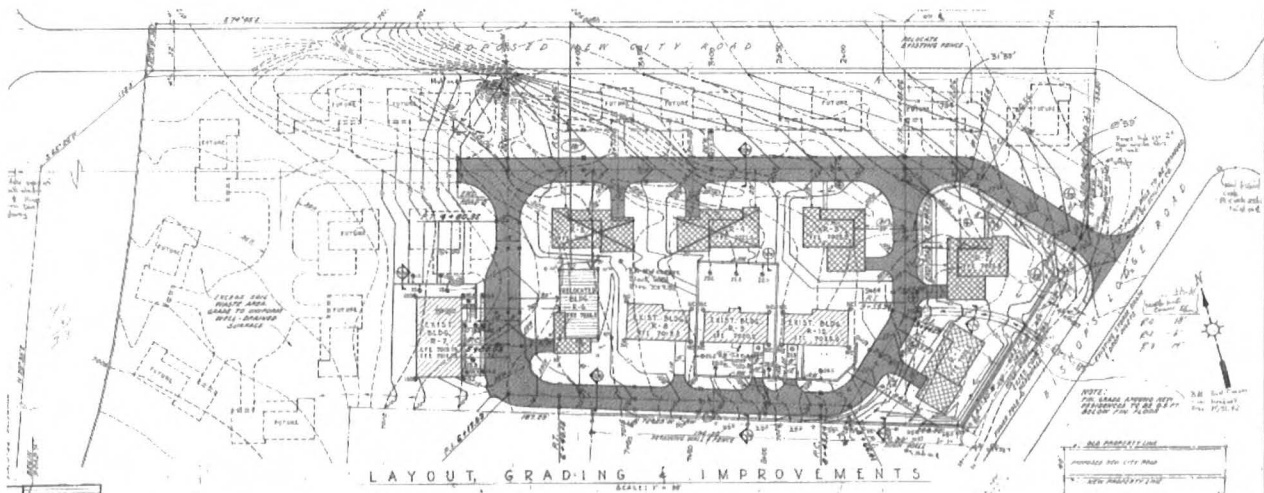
Portion of layout and grading plan showing cottages to be constructed, June 1960.
